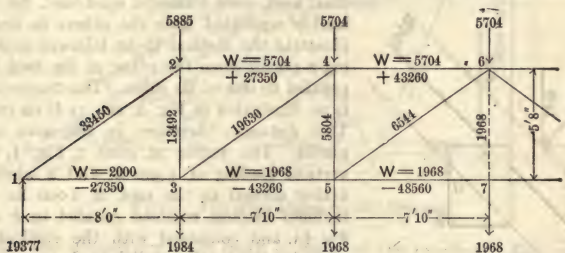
Howe-truss Diagram. Stresses in Truss Shown in Fig. 3
